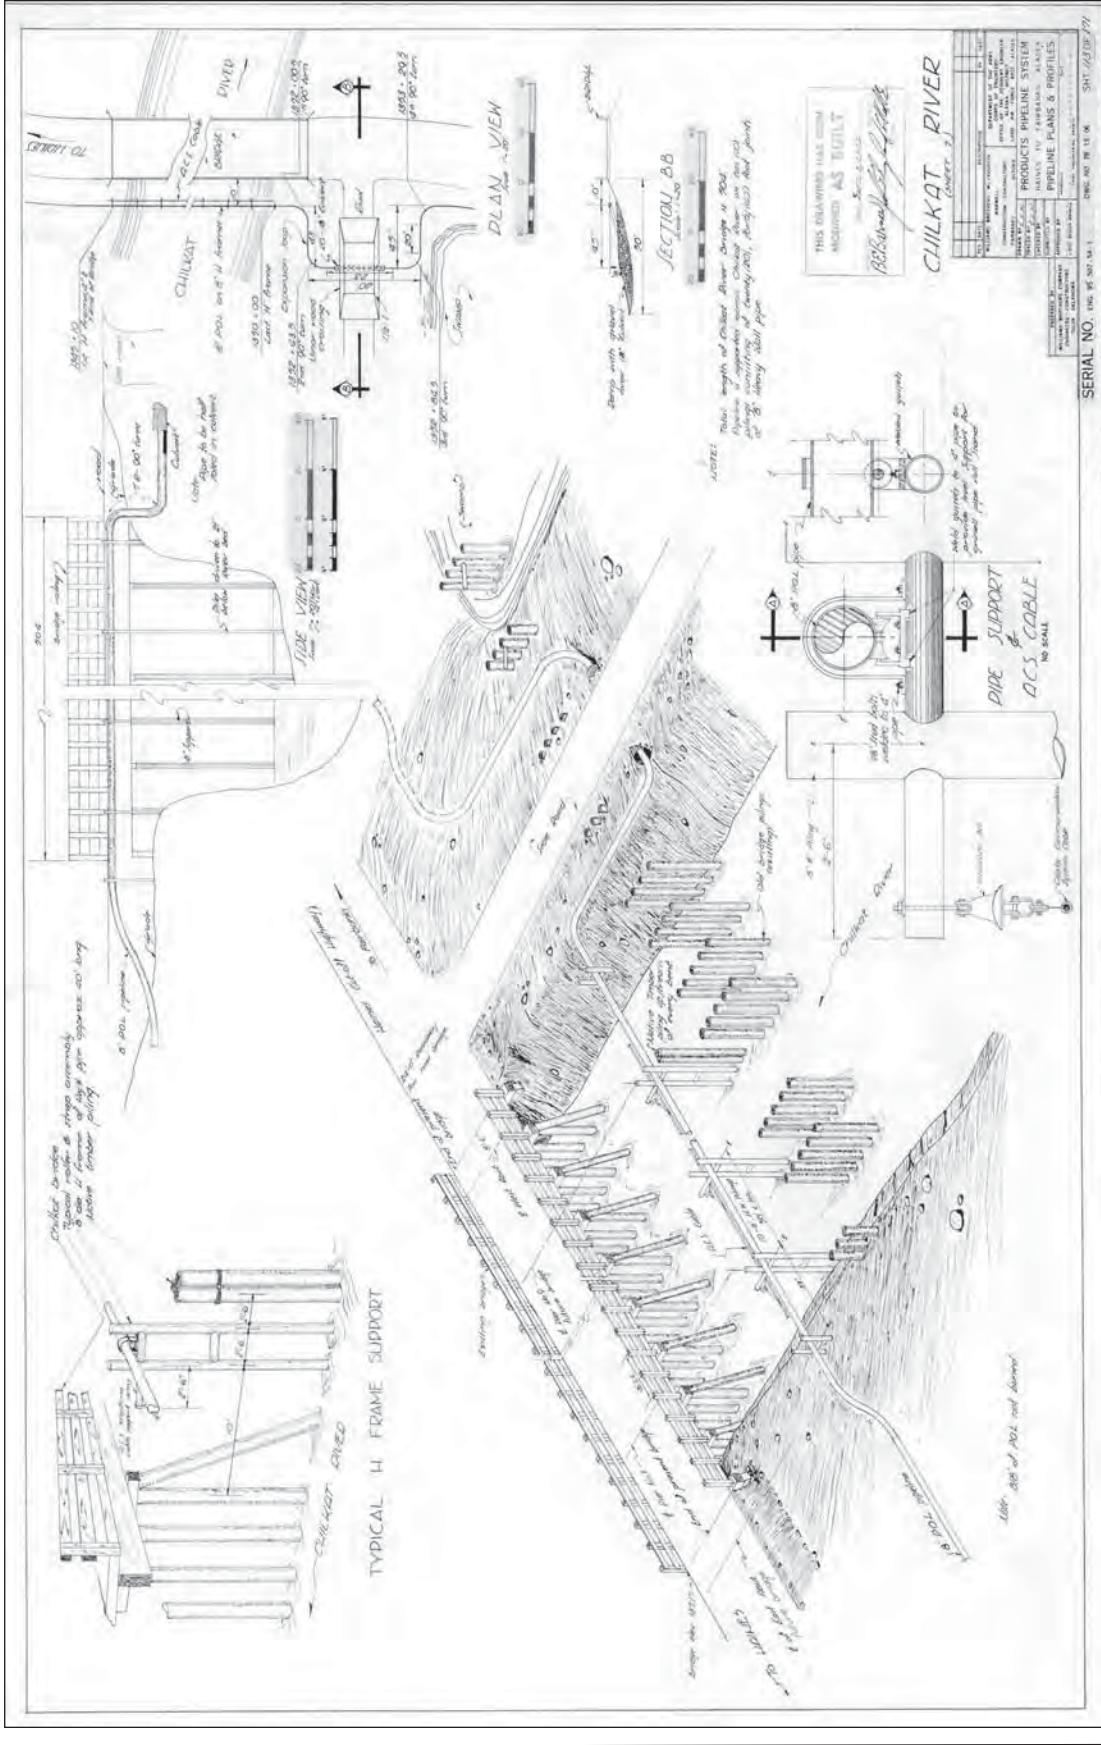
1955 plans of the Haines-Fairbanks Pipeline showing the completed 1943 timber trestle and the location of the former bridge.
